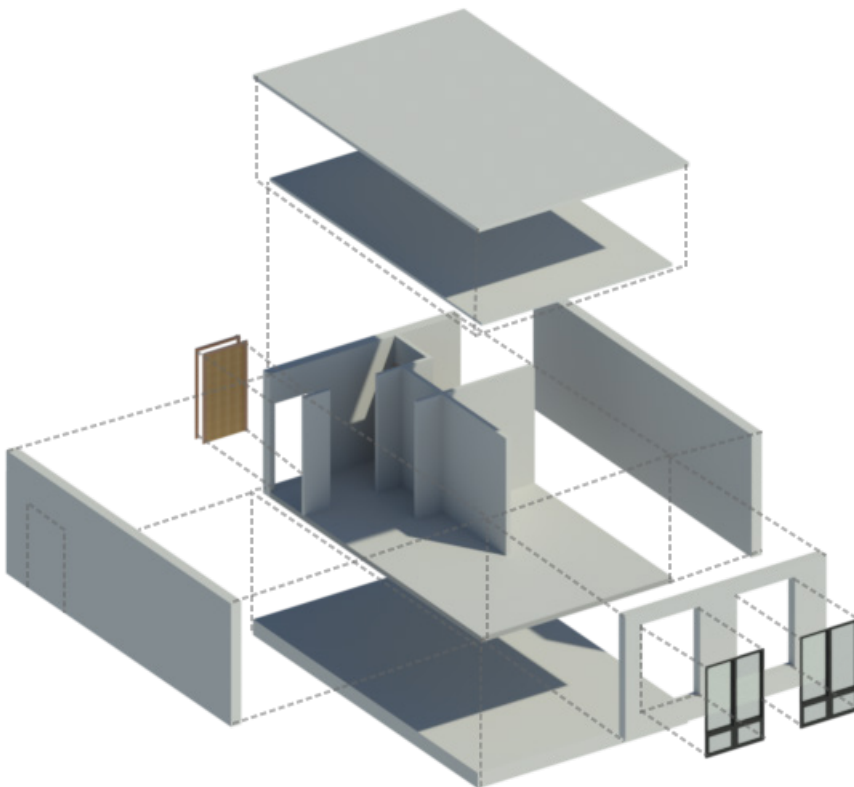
3D model shows an exploded view of module D2, with window openings on one side.
